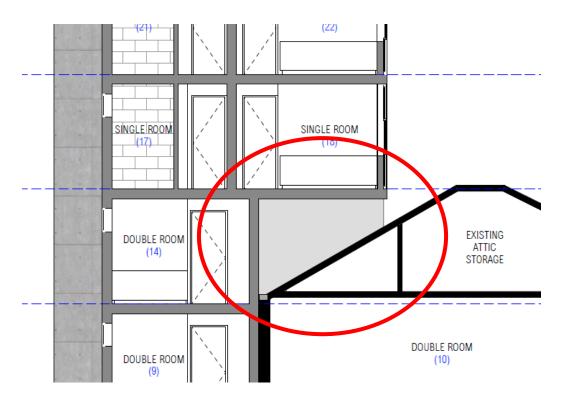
Section extract depicting the proximity of the cantilevered form of the new rear addition over the existing contributory building circled in red
